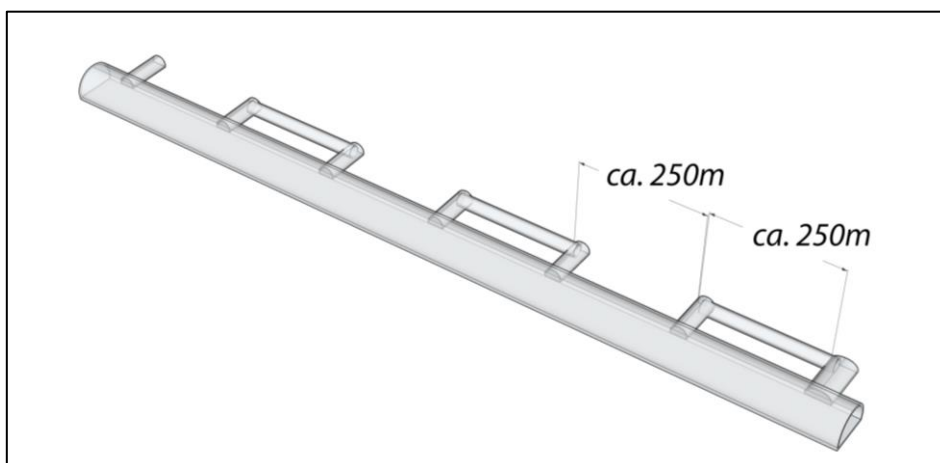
Illustration showing a system of short escape tunnels connecting shelters
